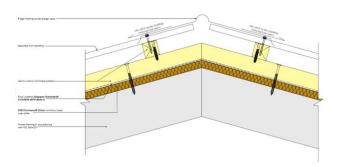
Mitre cut on the STEICO boards meeting at roof ridge
